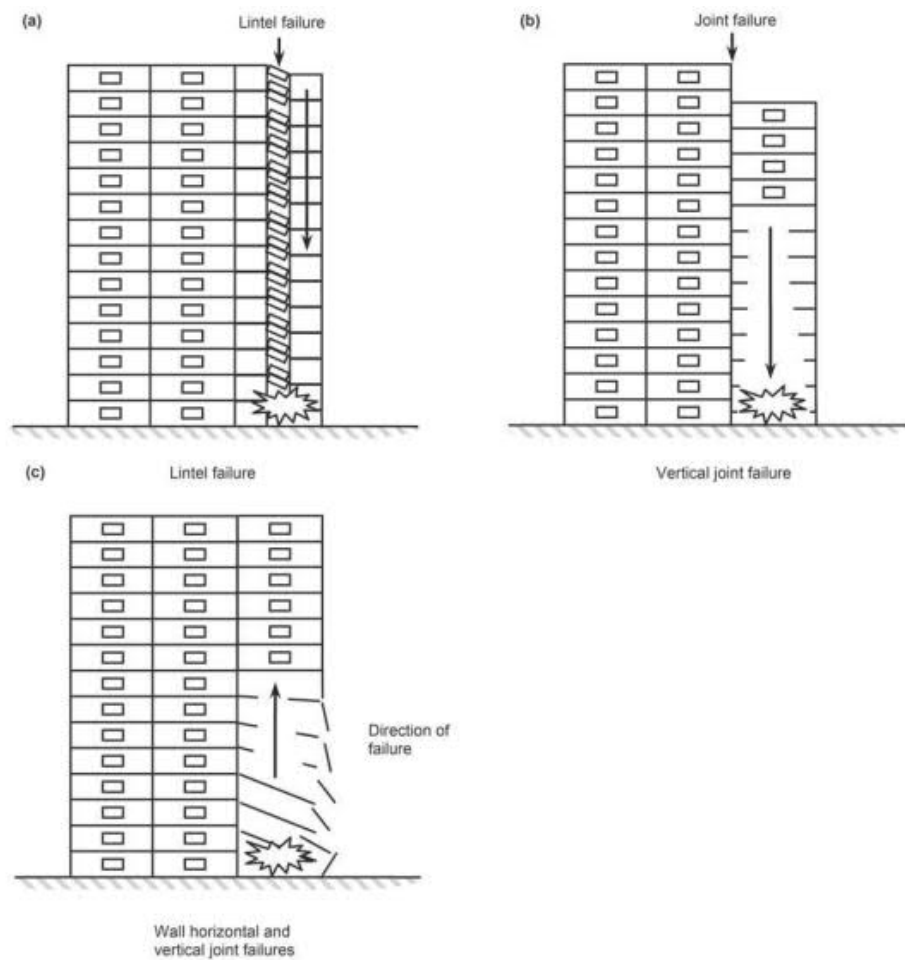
Schematic showing some possible progressive collapse failure modes of the flank wall in a typical LPS dwelling block for a low-level trigger site
